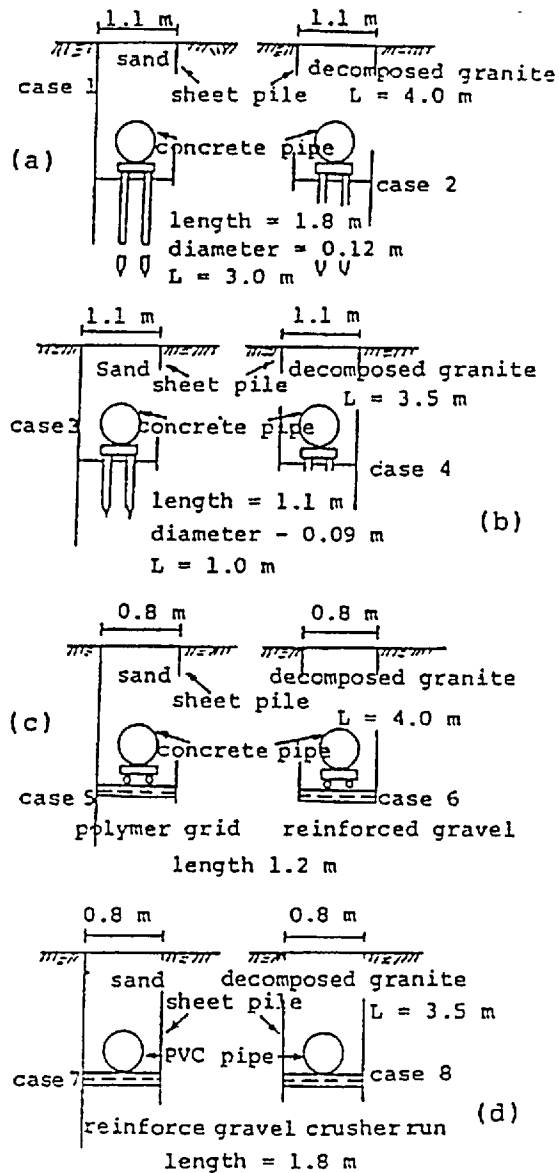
Sewage pipeline on soft and subsiding ground with reinforced foundations.
